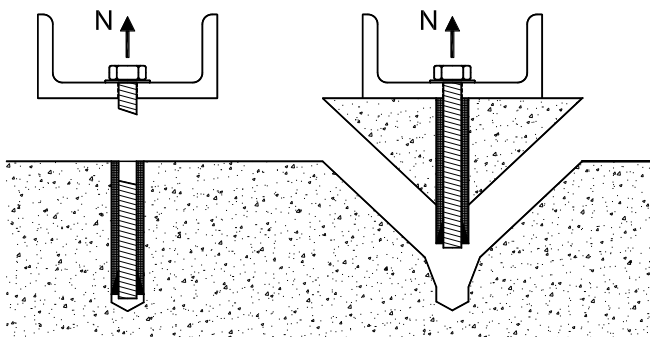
steel-bolt failure (left) and concrete-cone failure (right)
